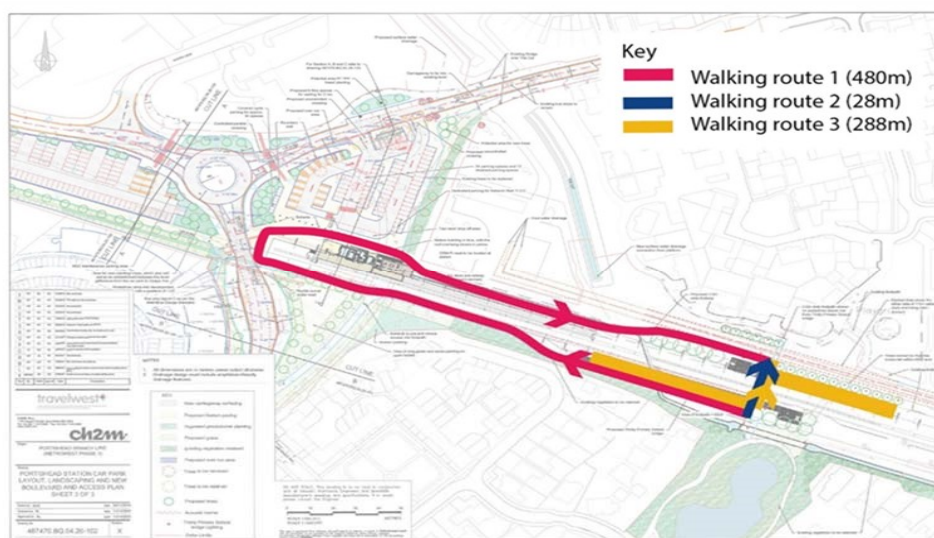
Trinity Footbridge alternative walking routes [Figure DE.1.3-1, REP2-013]
